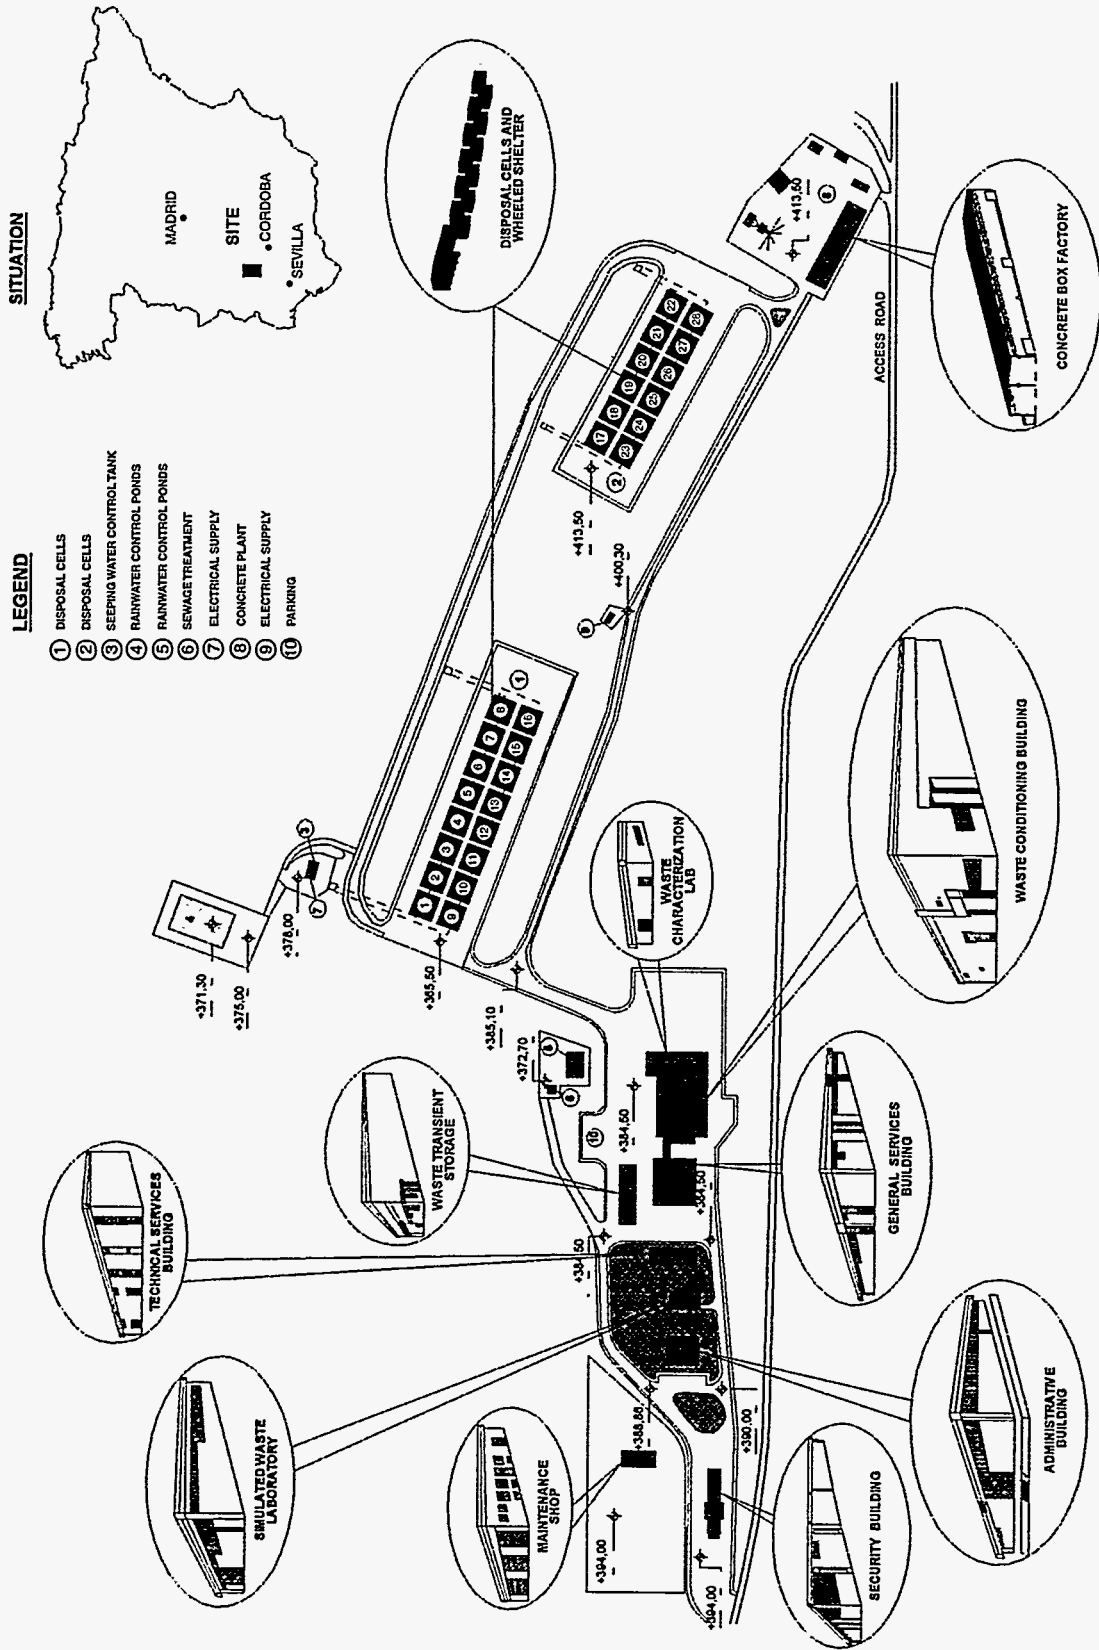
General layout of the "El Cabril" LLW disposal facility.
